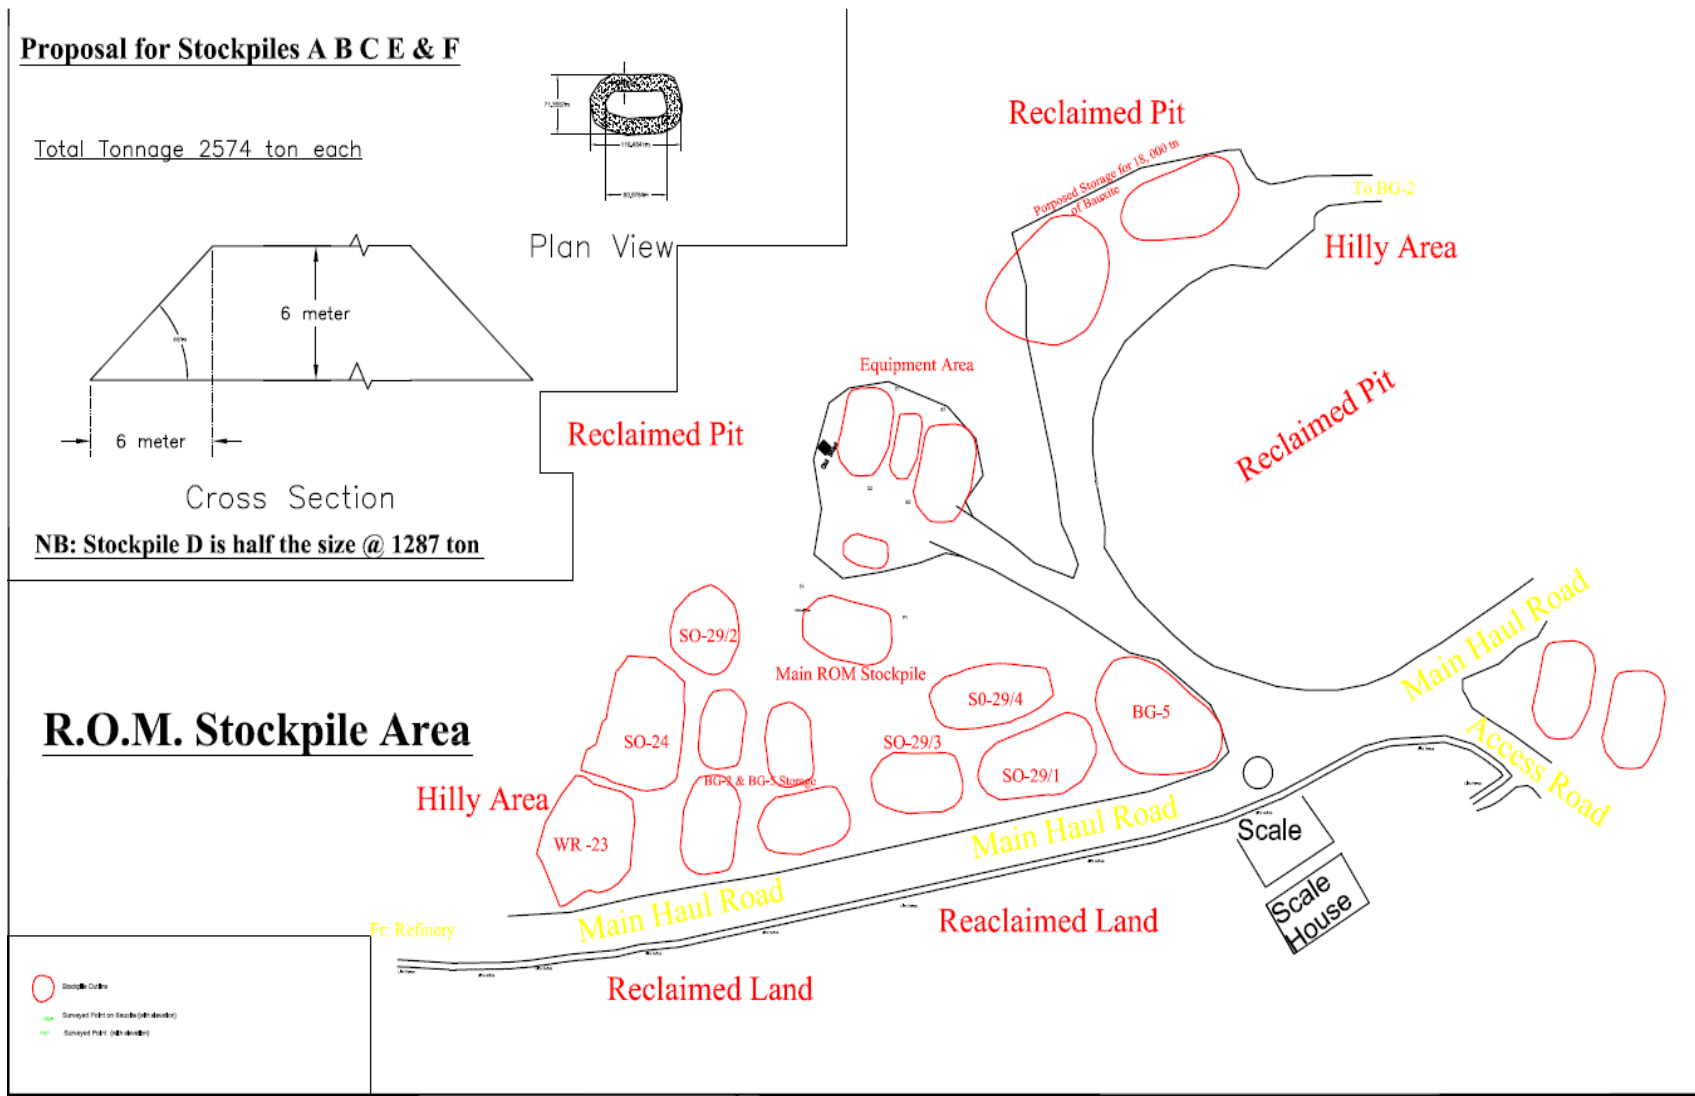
Typical Layout of R.O.M Stockpile Area
